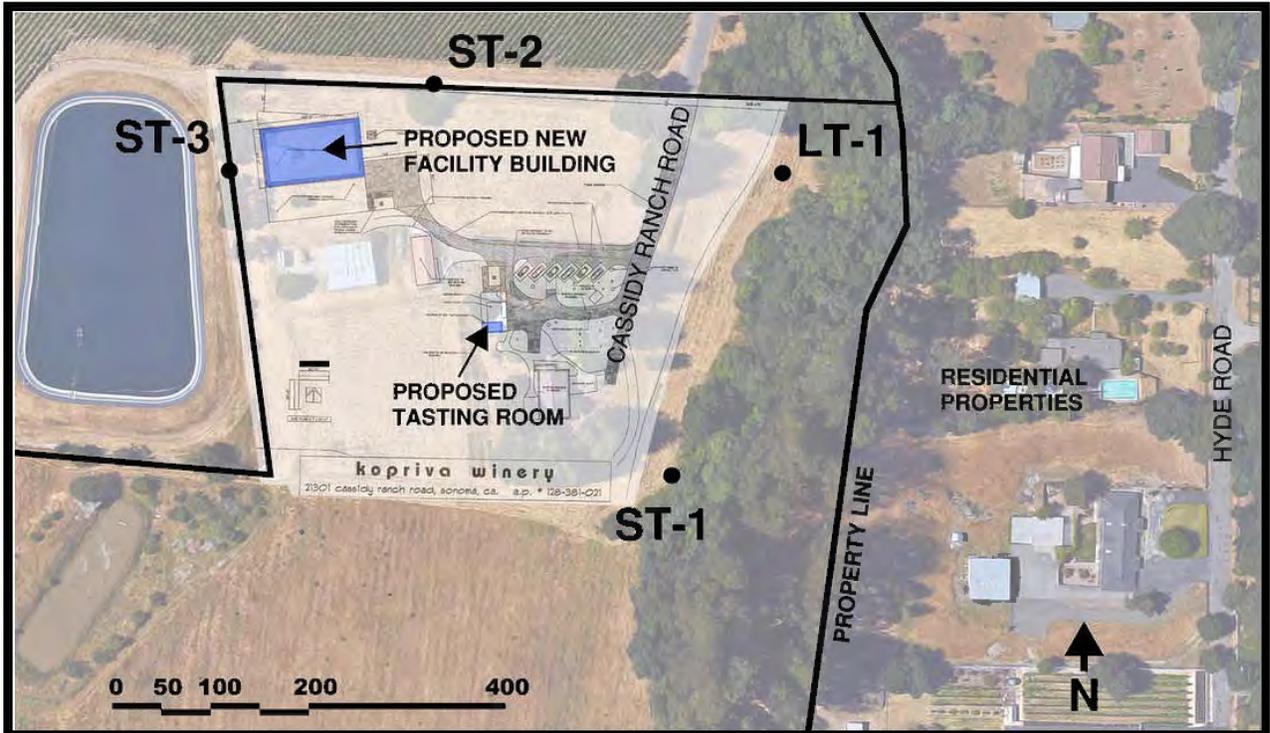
Site Plan and Ambient Noise Measurement Locations
